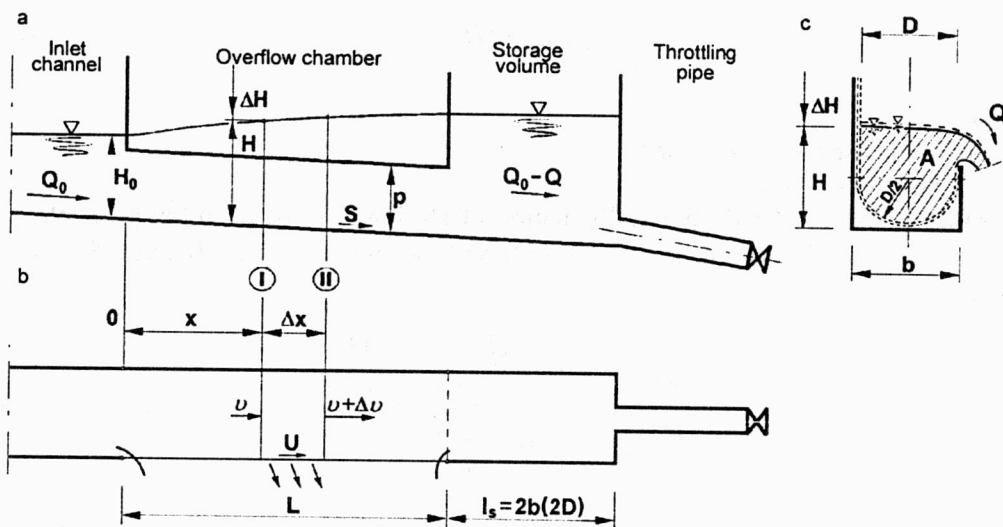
Definition sketch for channel with discharge over side weir and throttling pipe: (a) elevation; (b) plan; (c) section I-I
